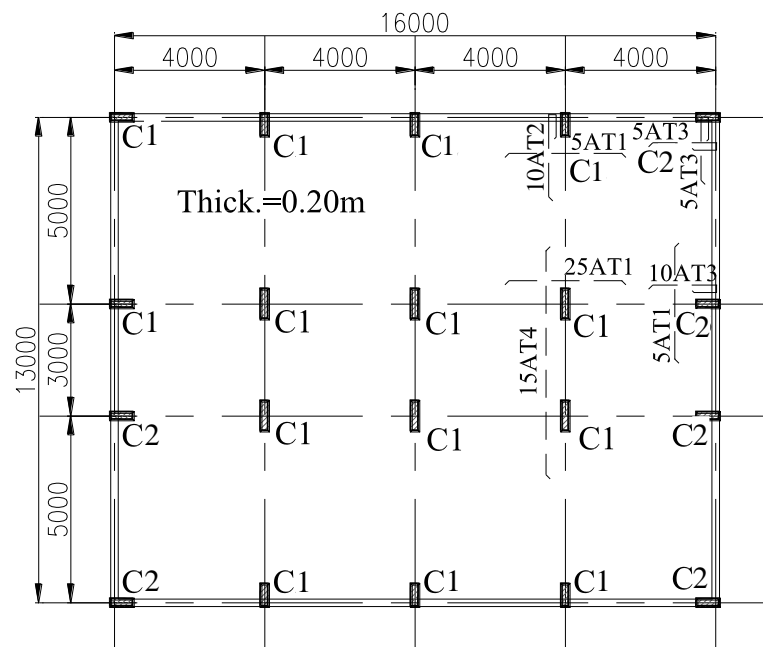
Typical reinforcement details for the floor slabs of the 2-story building
